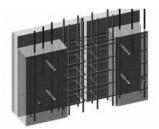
Rebar Layout in Cast-in-situ Joints of Prefabricated Components
